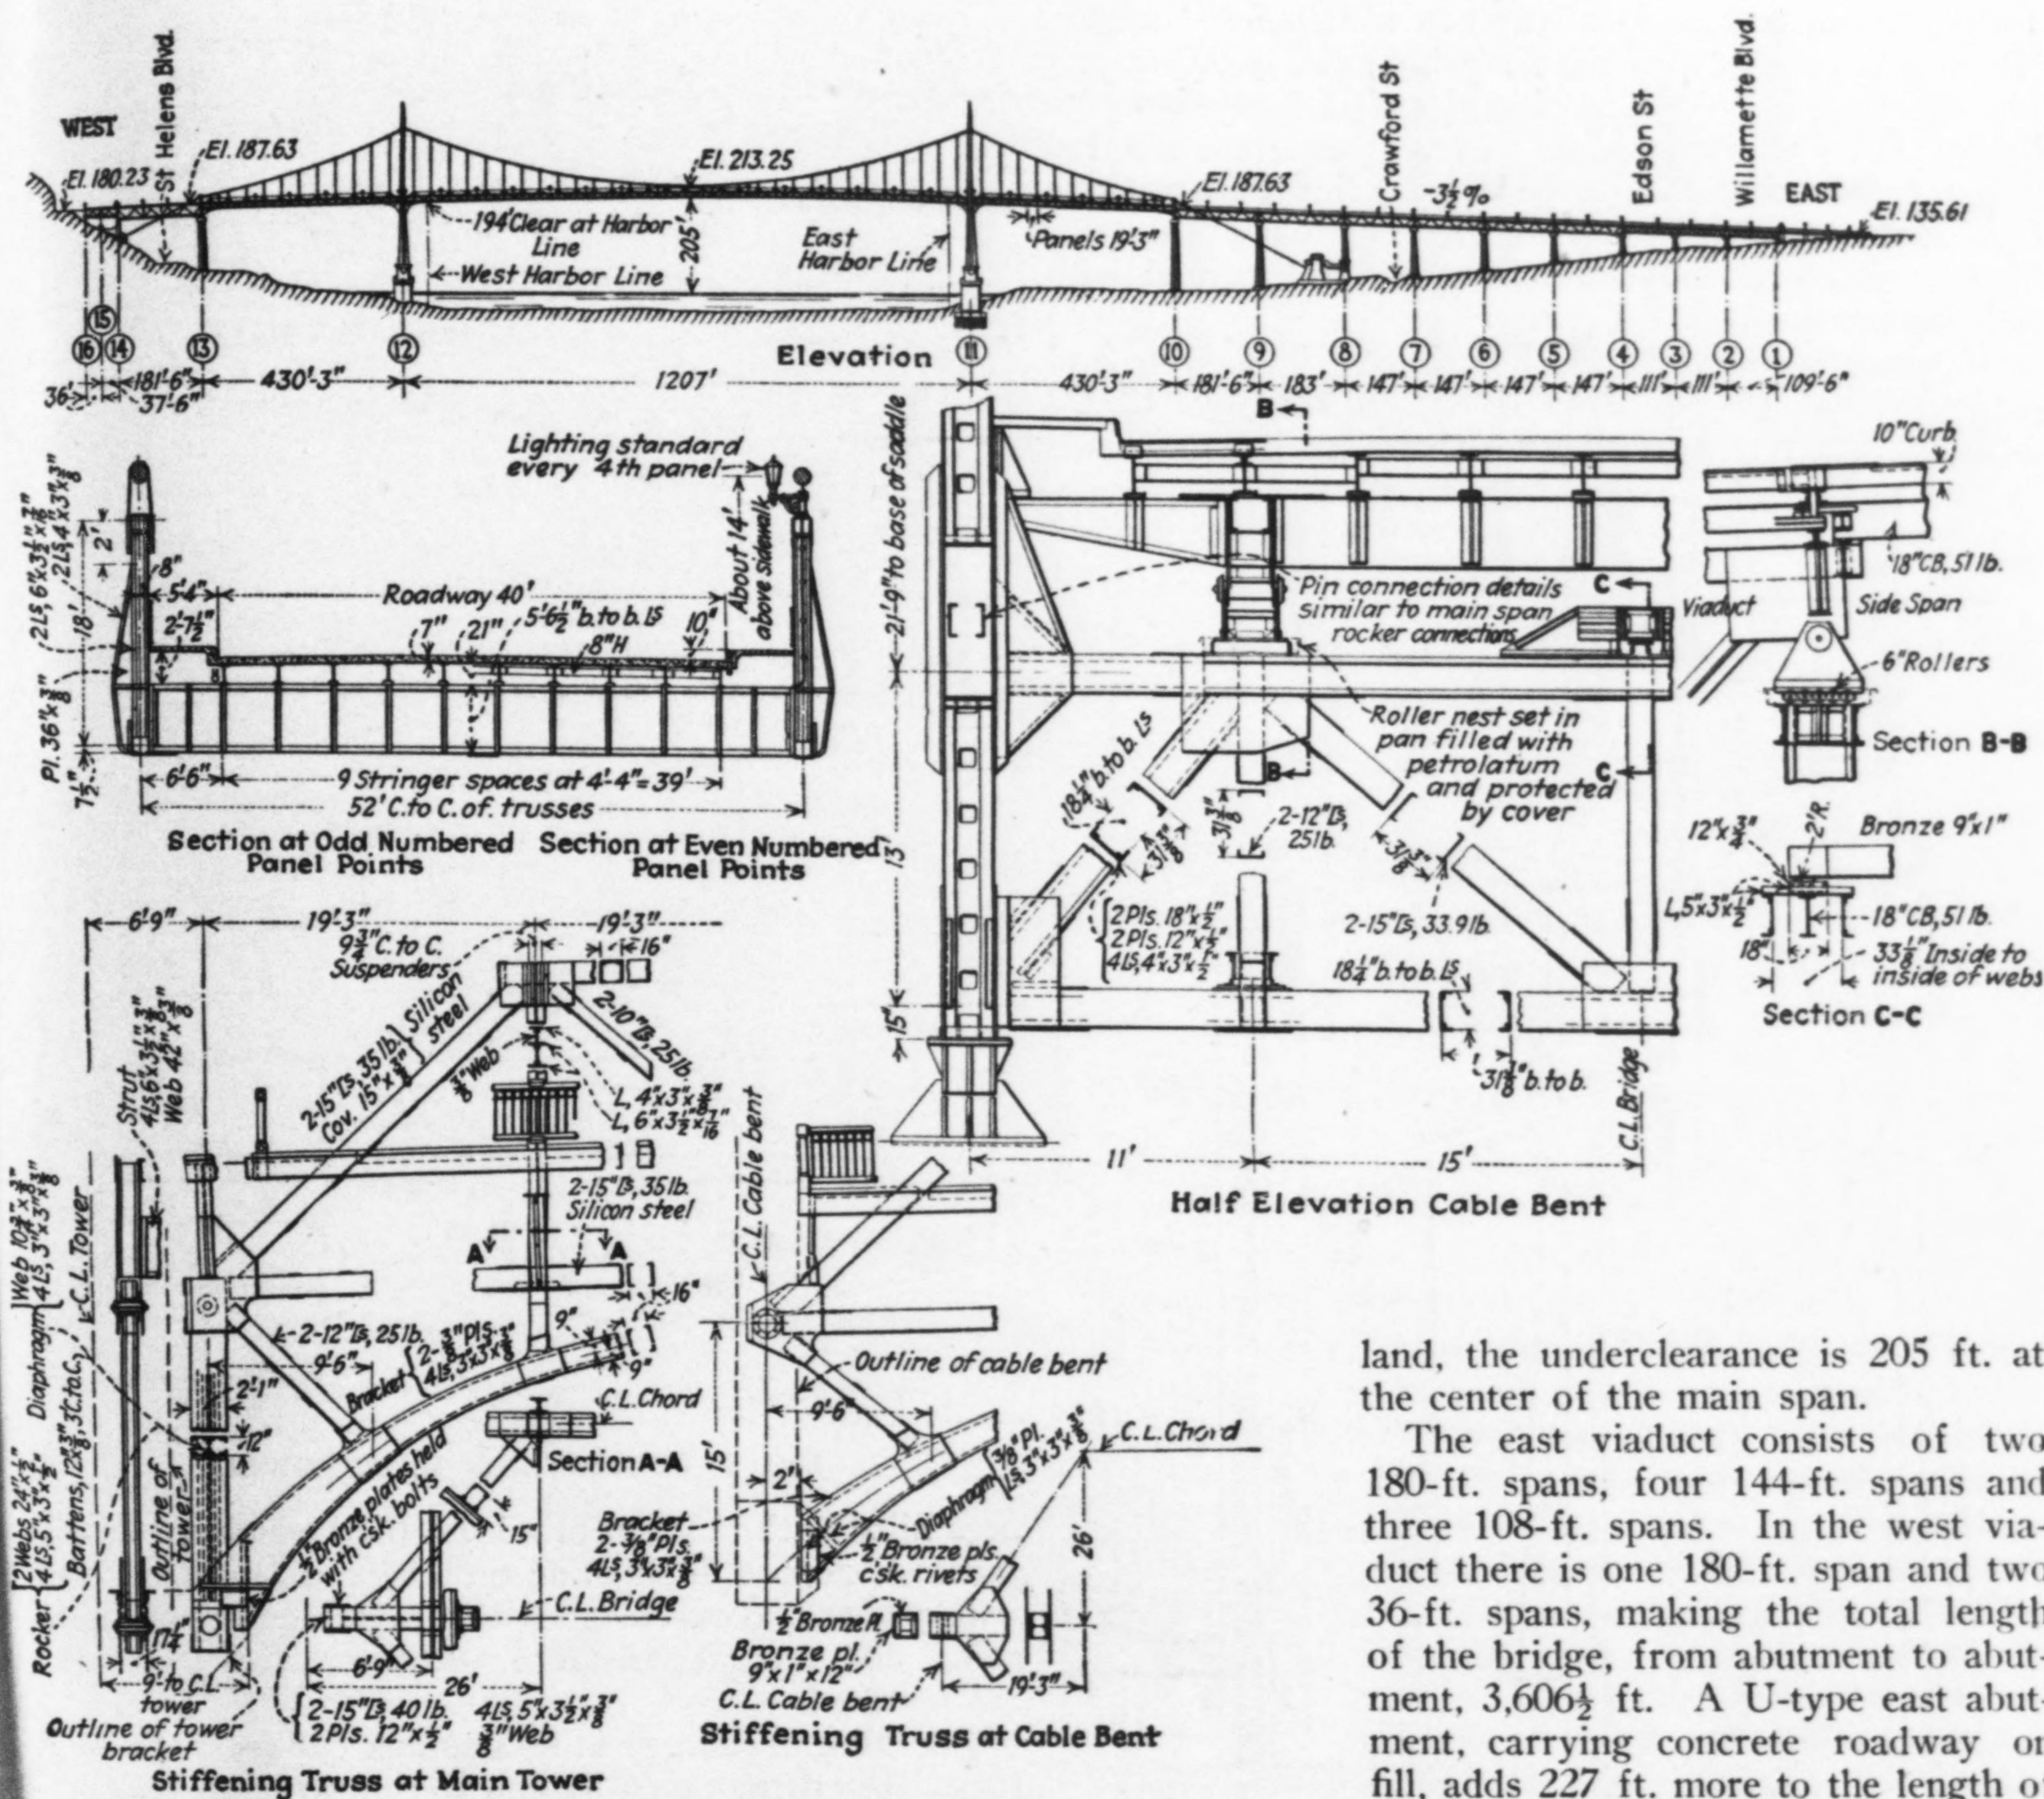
PRINCIPAL DETAILS OF ST. JOHNS BRIDGE Including stiffening truss connections at main and cable bent towers.
